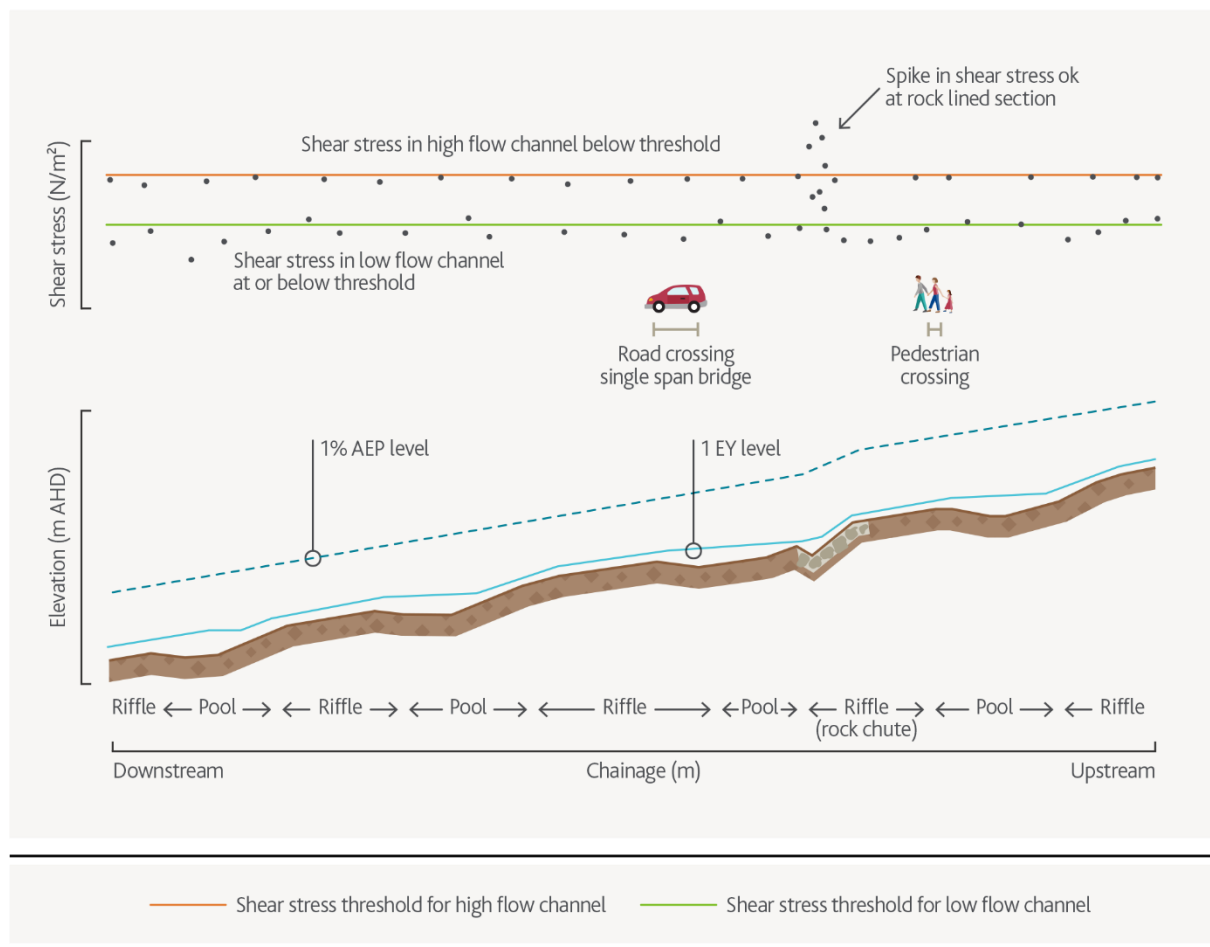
Example longitudinal profile of constructed waterway shear stress, thresholds, relevant features and infrastructure
